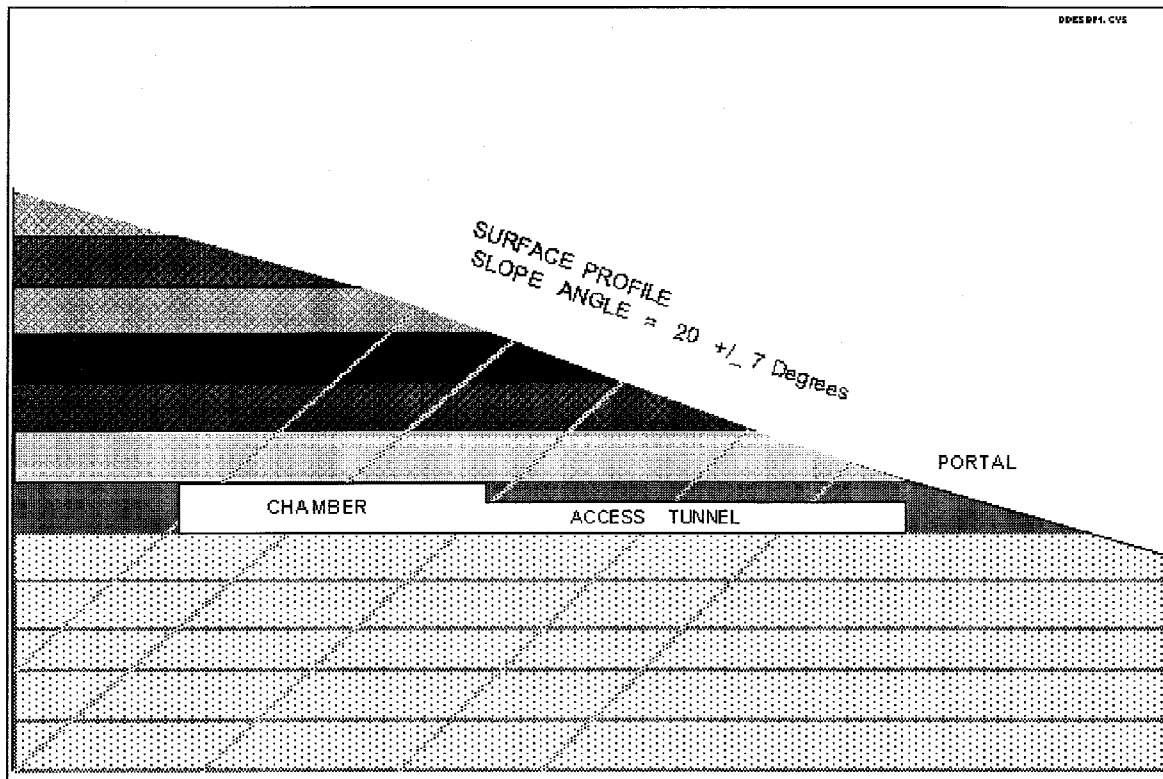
SECTIONAL VIEW THROUGH A TYPICAL TEST BED.
